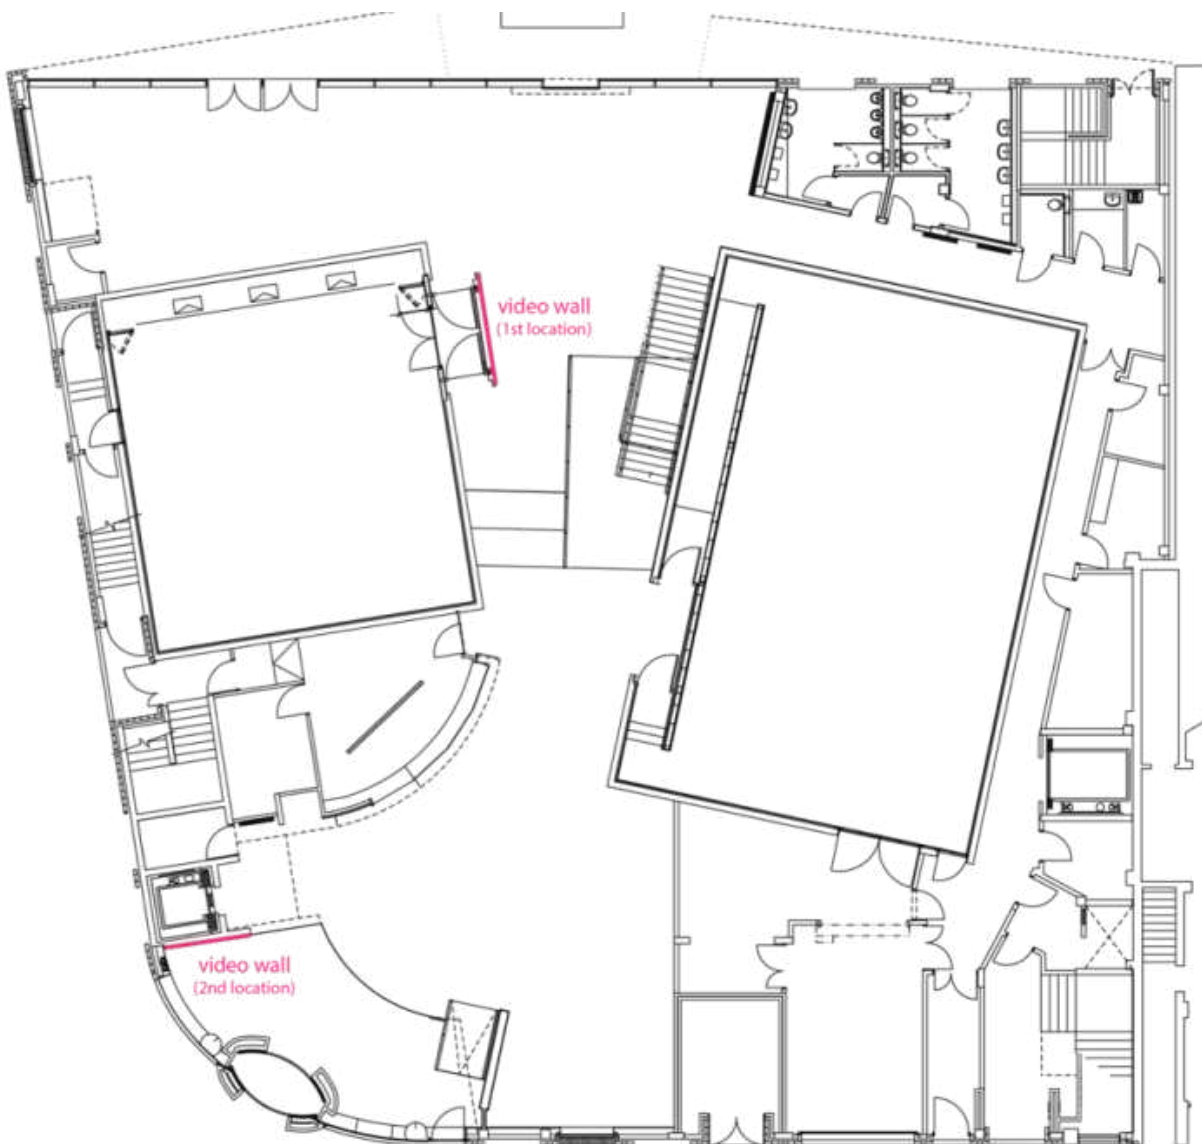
Ground floor plan of FACT with video wall's first and second locations
